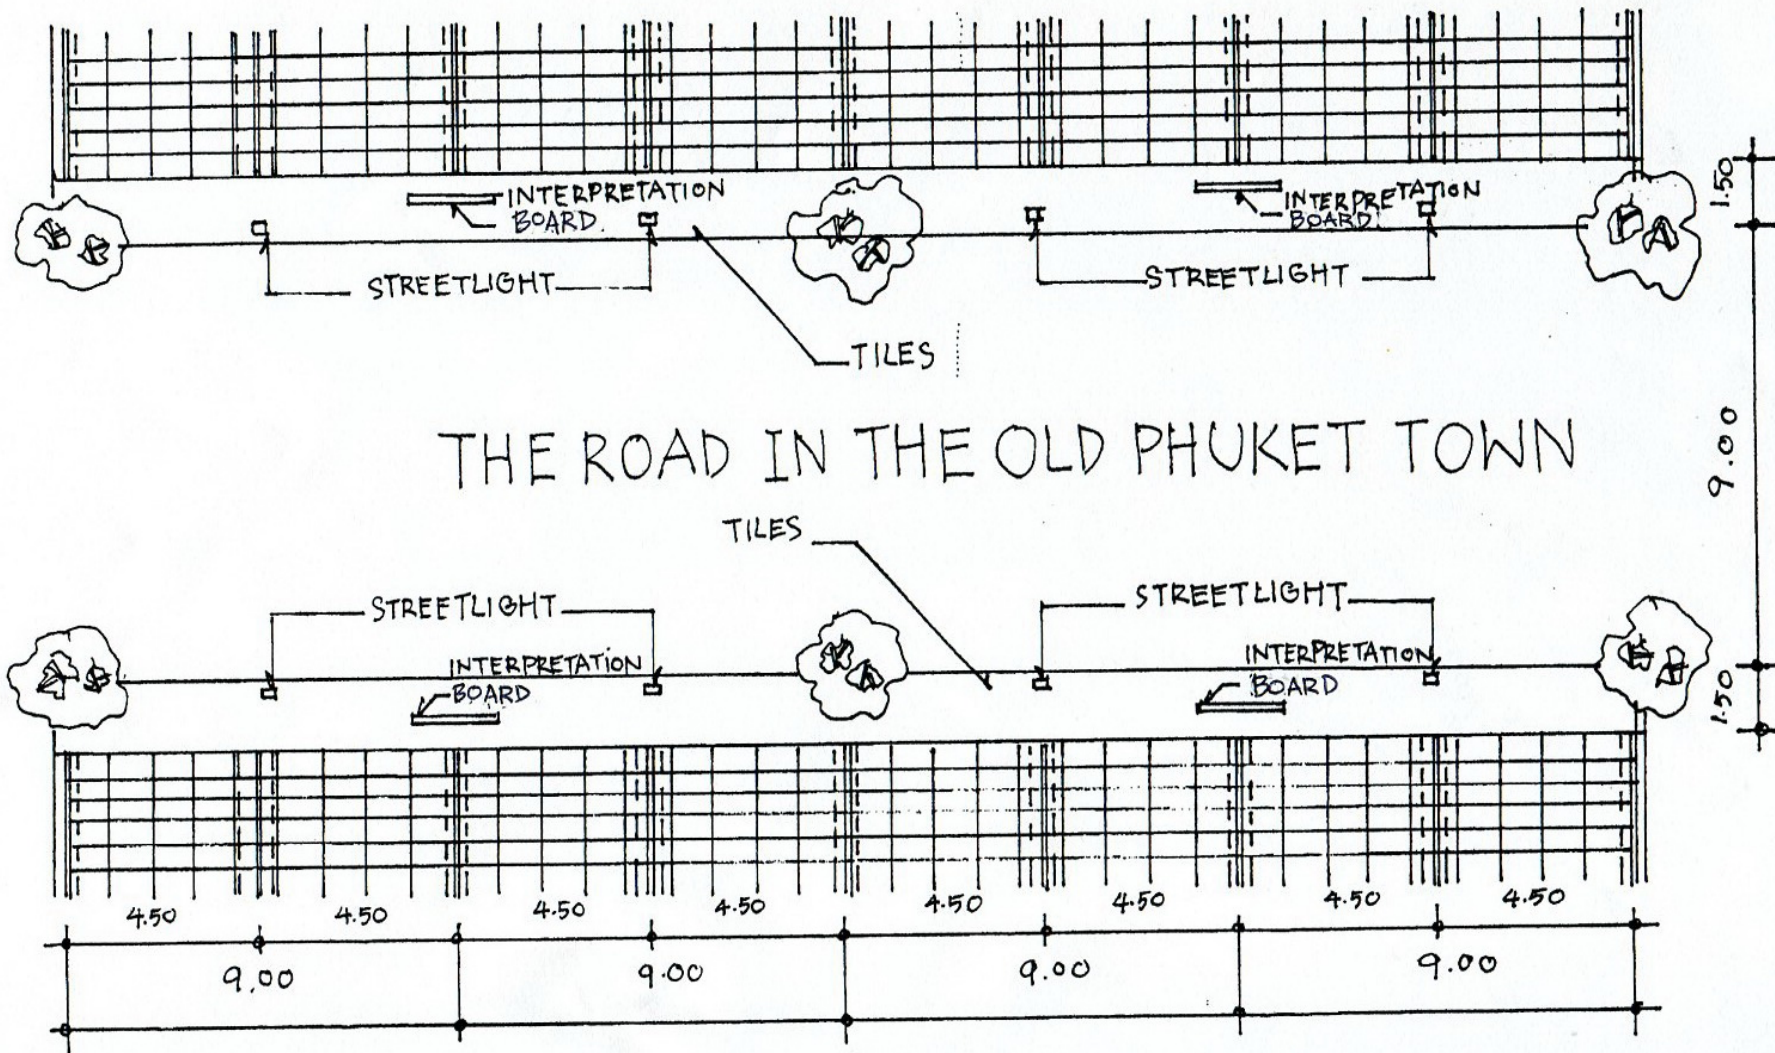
Plan of streetscape upgrades on Krabi road, Yaowarat road, Phang Nga road and Dibuk road in Phuket
